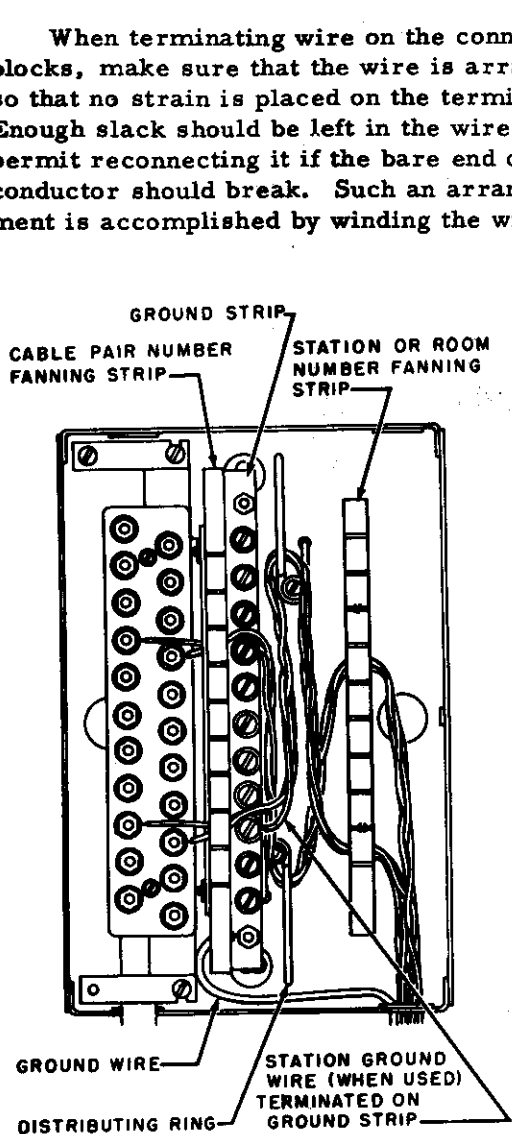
Typical Arrangement of Station Wires at a Distribution Terminal
